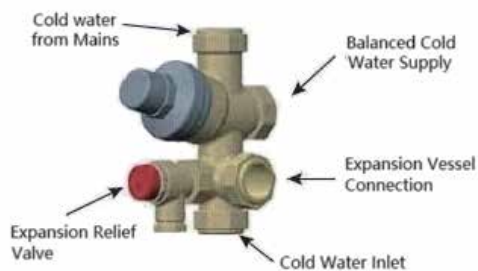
Detail showing the connection of the expansion vessel to the inlet group.
